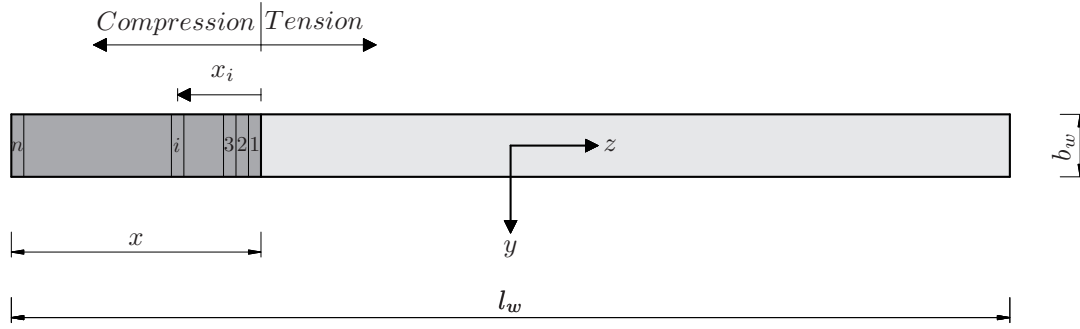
Wall local axis convention and concrete compressed fibres.
